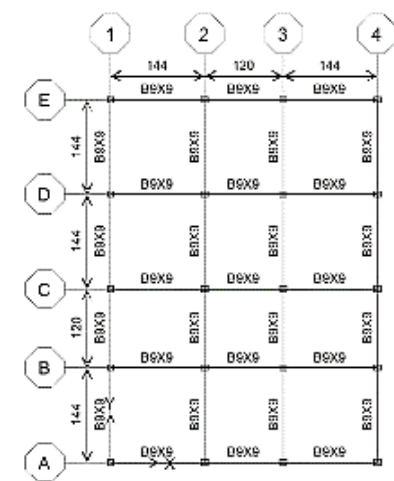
Typical beam section plan of proposed building for T-1 (in)
